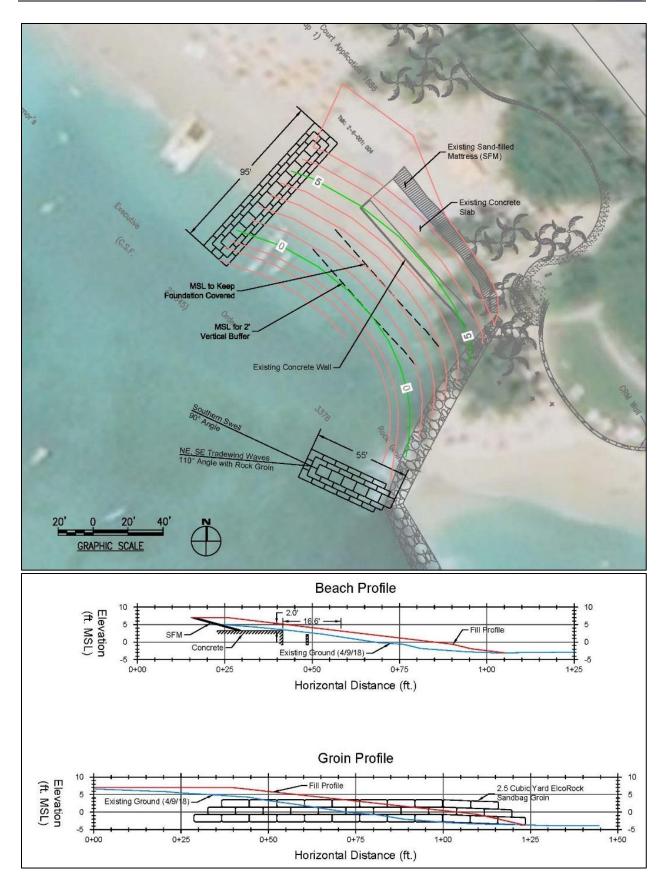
Plan 2: Straight groin with Kuhio stub groin
